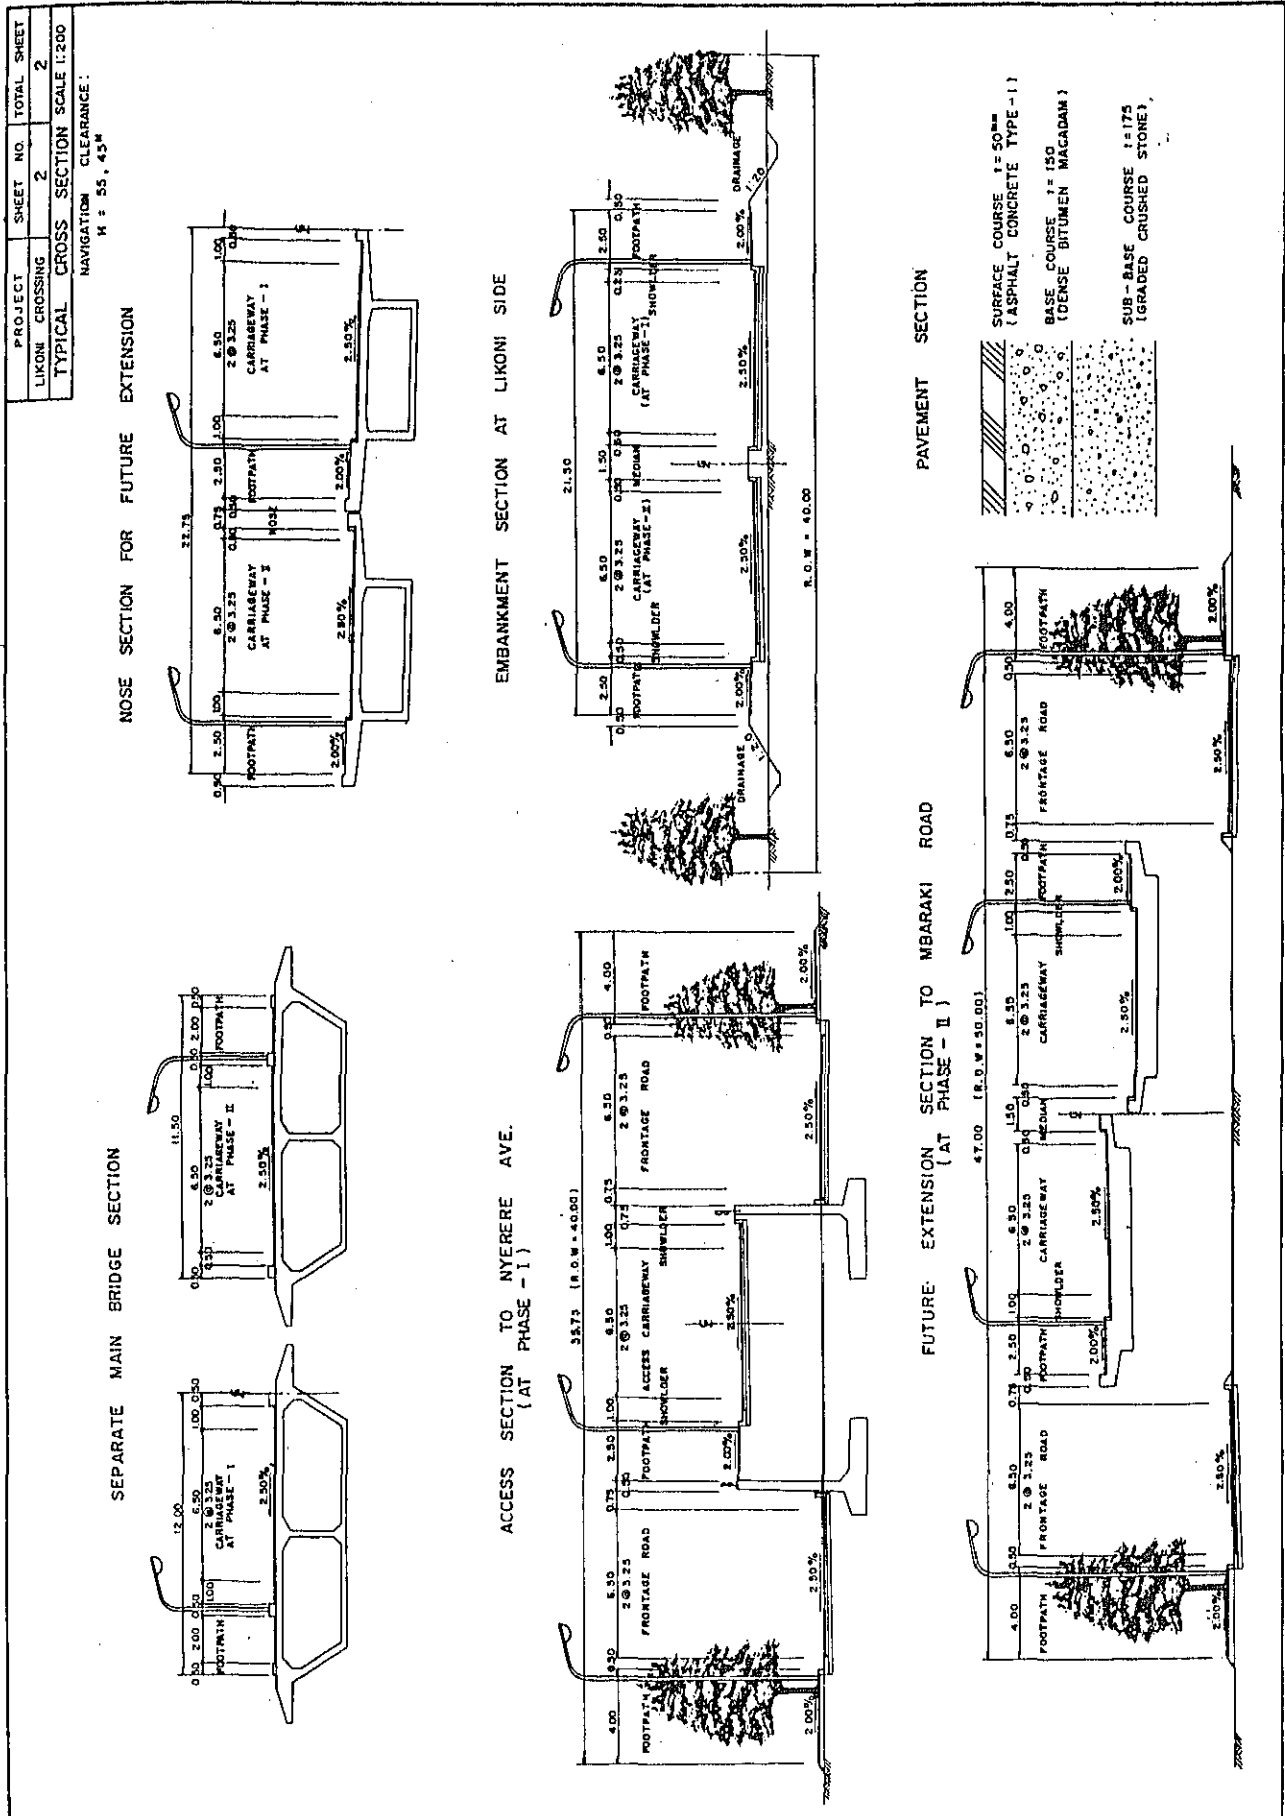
TYPICAL CROSS SECTION (H = 55 AND 45 M)
